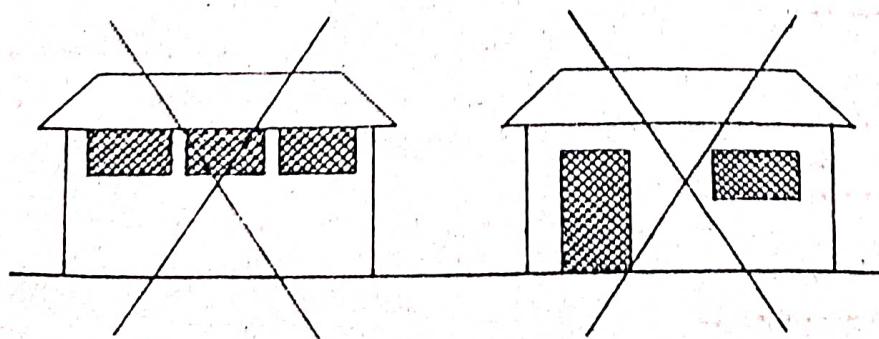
Faulty placing of openings near roof lines and near the corners of walls
